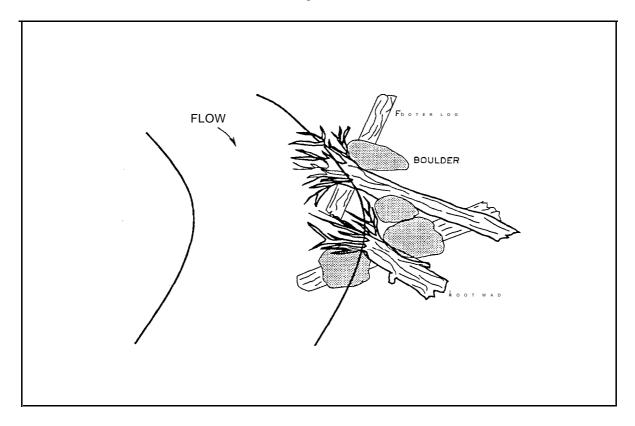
Plan view of native material revetment (Rosgen, 1993)
